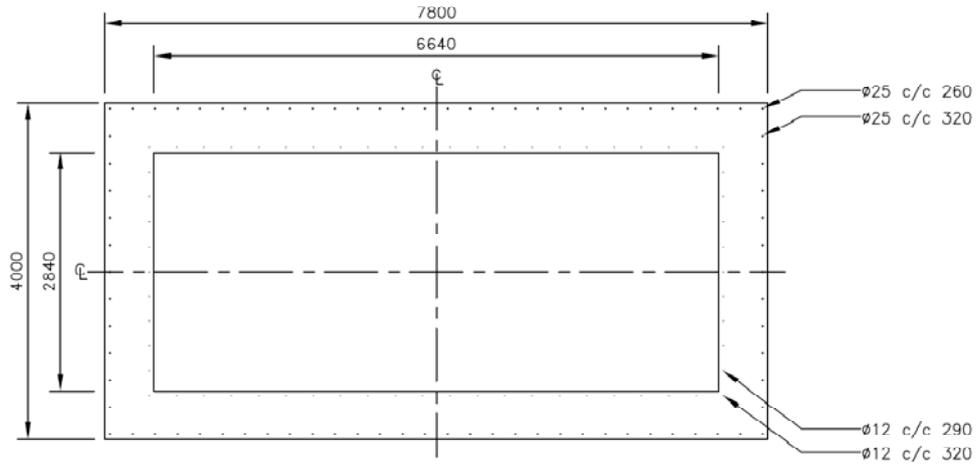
Cross-section of pier 28 in the Öland Bridge
